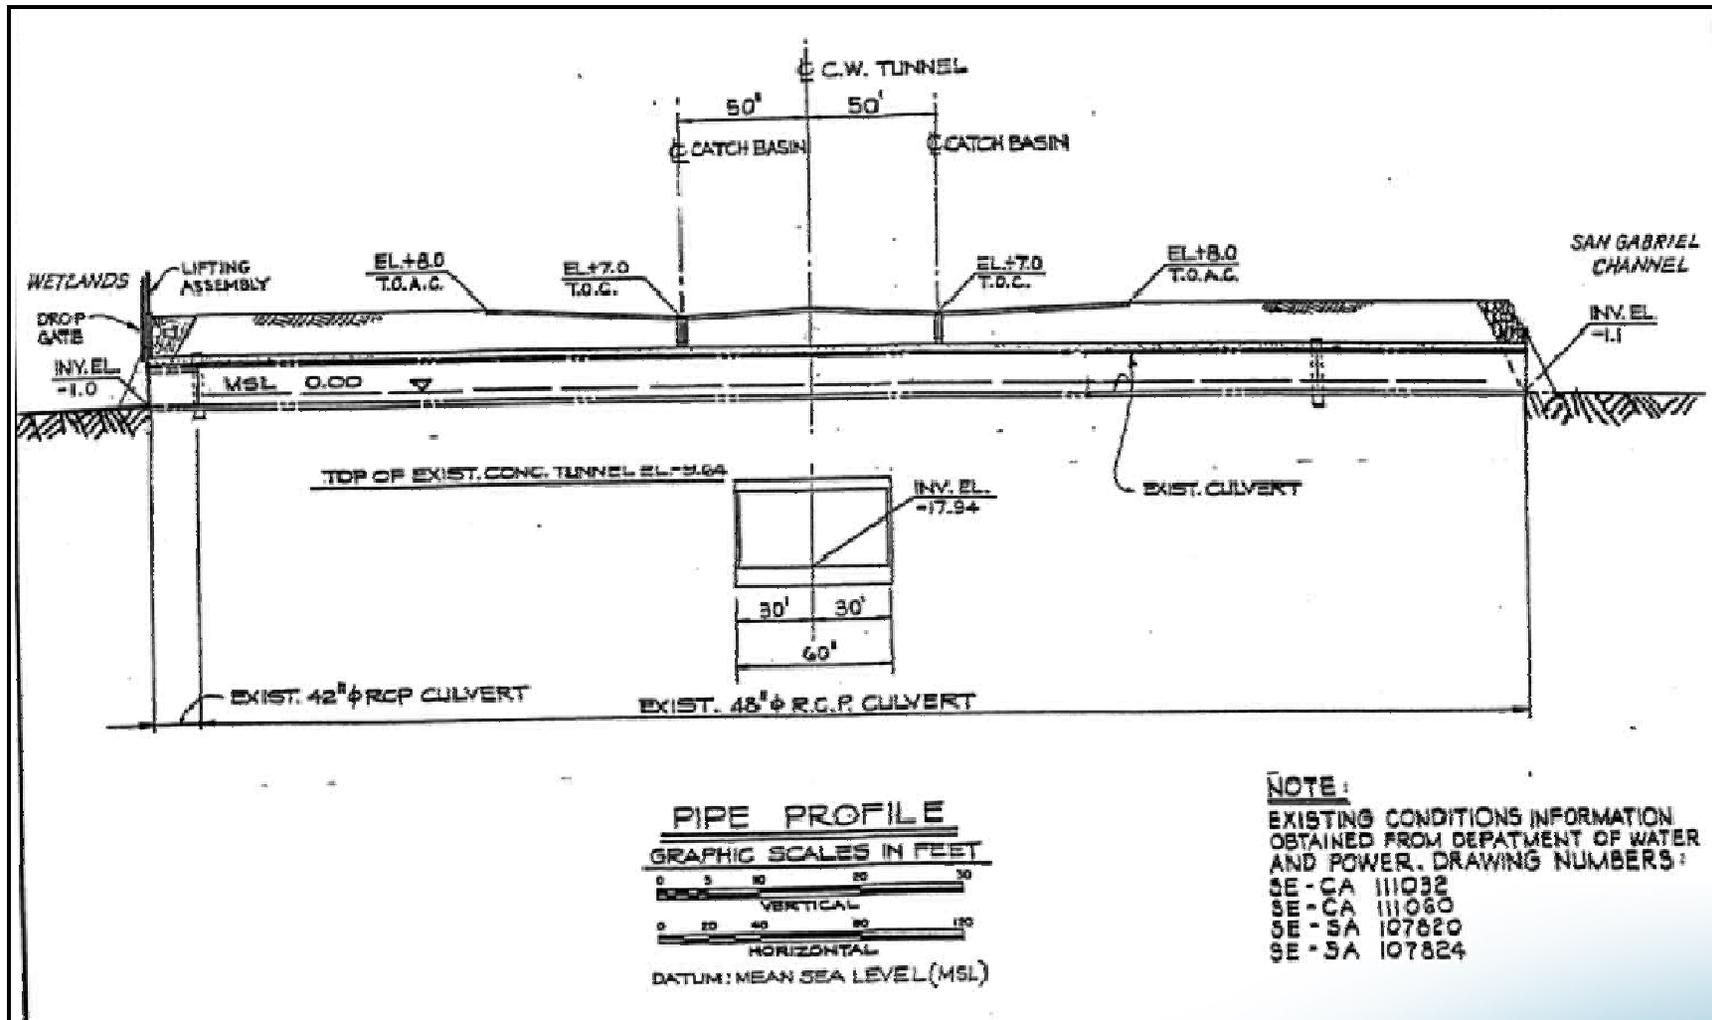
Profile of Culvert Section of Hellman Channel Above the Haynes Channel (“Tunnel”) (M&N 1996)
